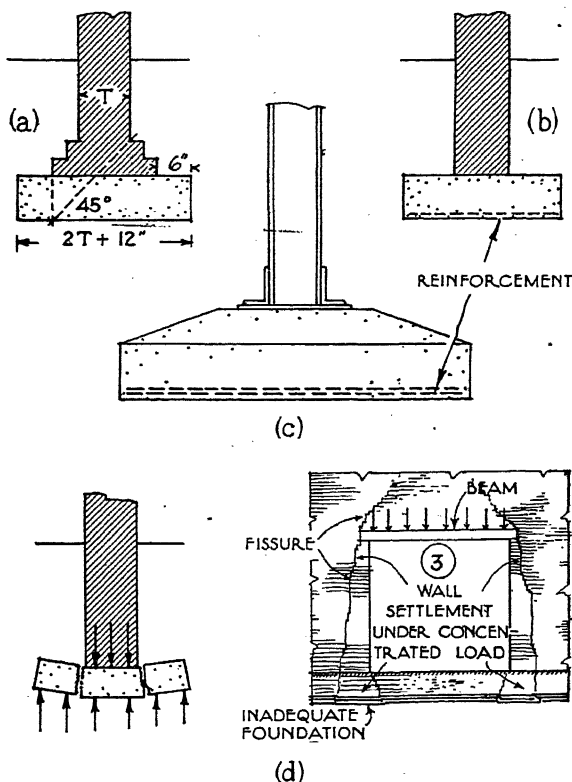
FOUNDATIONS (a) Standard setting out of wall foundation. (b) Reinforced concrete foundation. (c) Reinforced column foundation. (d) Fractured foundation.
